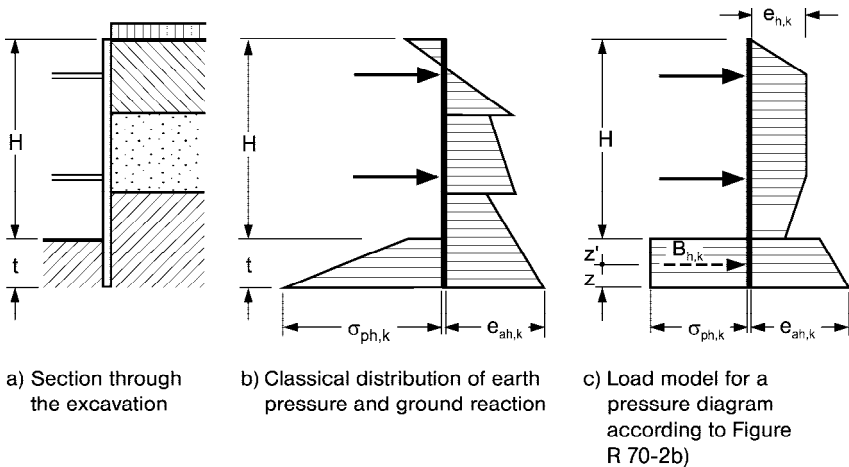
Load model determination for sheet pile walls and in-situ concrete walls with active earth pressure and free earth support
